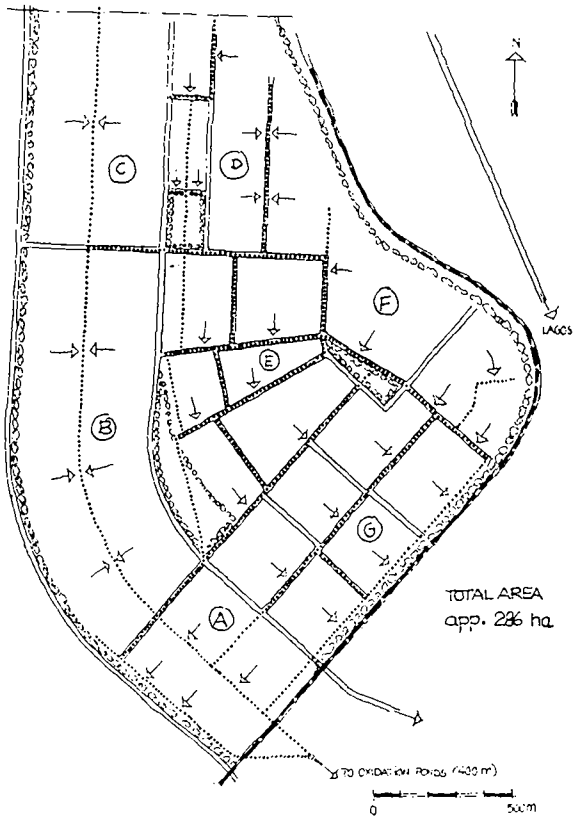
Layout and Difications for sizing of trunk sewers.
